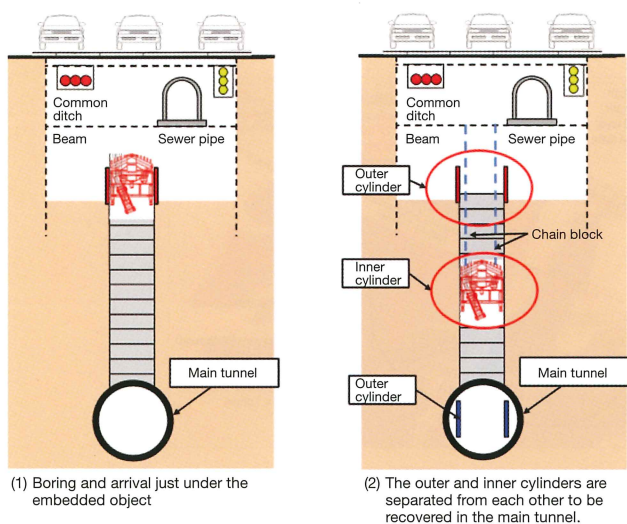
Conceptual diagram of the upward shield machine removable through a tube
